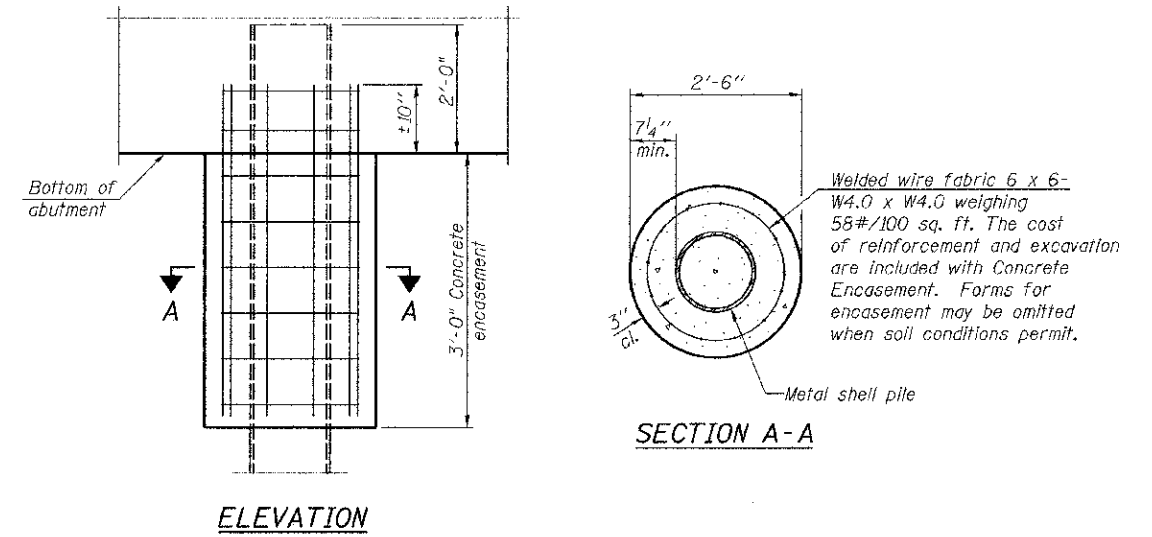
DETAIL OF CYLINDRICAL STEEL SHELL FOR CAST IN PLACE CONCRETE PILES
